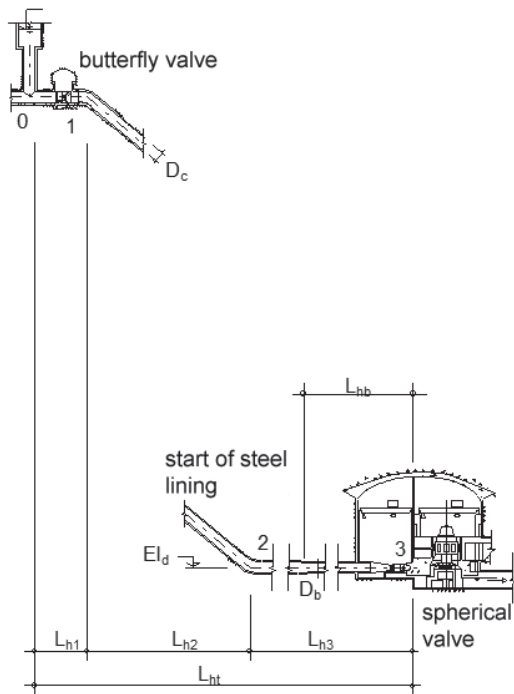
Cross-section of a pressure tunnel.
